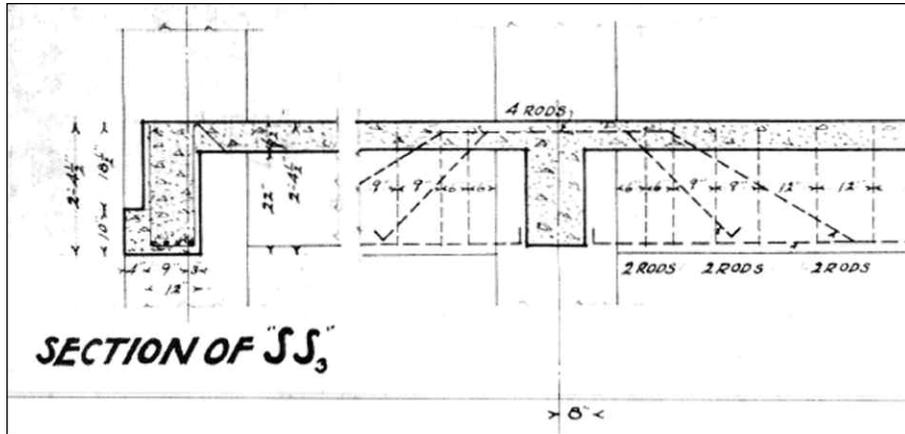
Concrete-beam reinforcing, Plymouth Building, Minneapolis, Minnesota. The drawing, dated April 25, 1910, shows typical beam reinforcing with a spandrel beam condition at the left. The spandrel beam is concealed by masonry veneer at the primary facades and exposed at the secondary facades. A concrete shelf is provided to accommodate one wythe of masonry, with additional wythes placed on top of the beam and inset from the face of the building. Courtesy of Meyer Borgman Johnson, Minneapolis.
